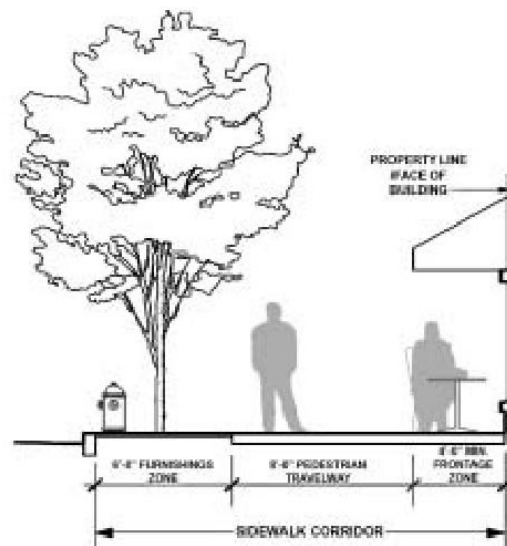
Sidewalk Corridor Zones for Arterial Streets
